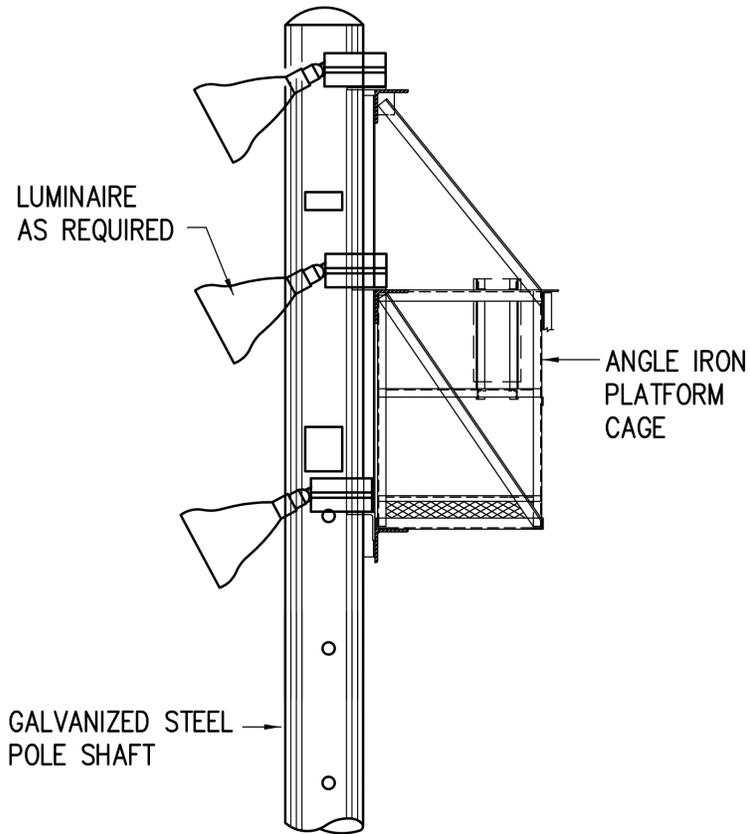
LIGHT FIXTURE ELEVATION
